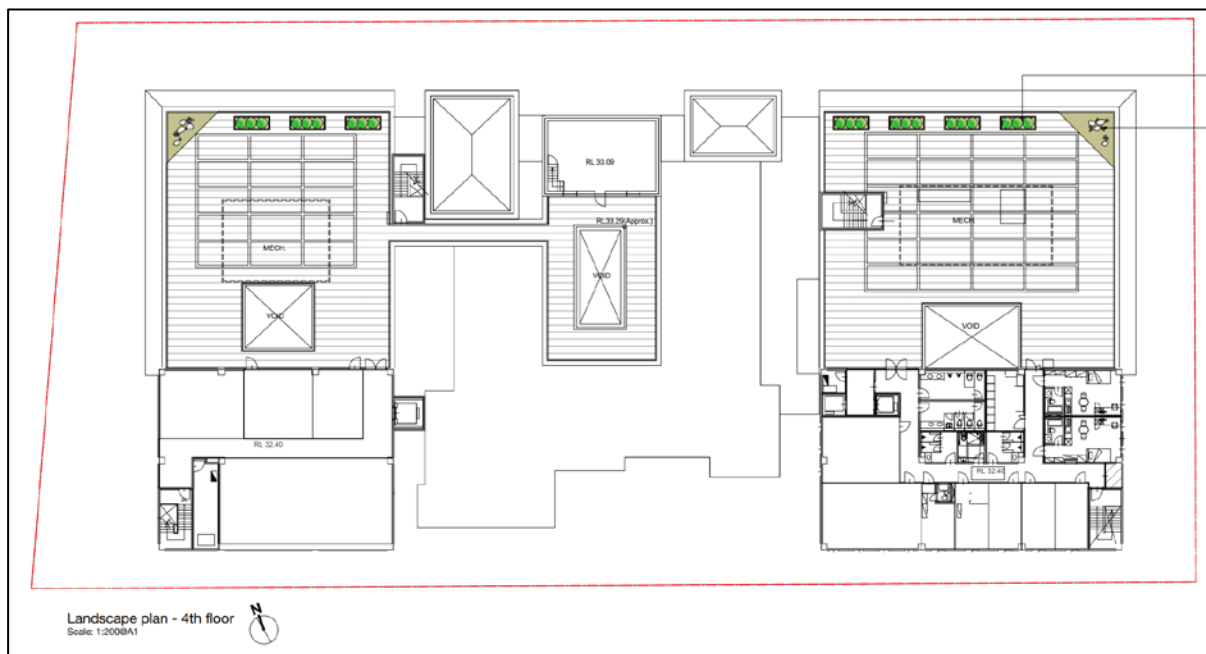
| Proposed rooftop terrace landscape design (Source: Moir Landscape Architects)
